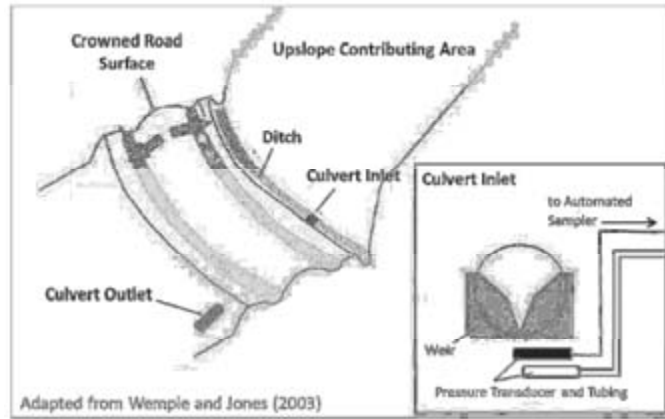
Schematic diagram of a study road segment showing road surface and adjacent hill sides. Inlet diagram shows culvert inlet with equipment installed for monitoring. See also Figure 3.
